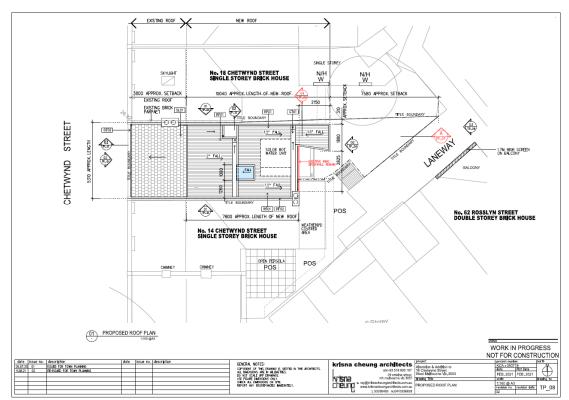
Roof Plan (source: Krisna Cheung Architects Pty Ltd)
